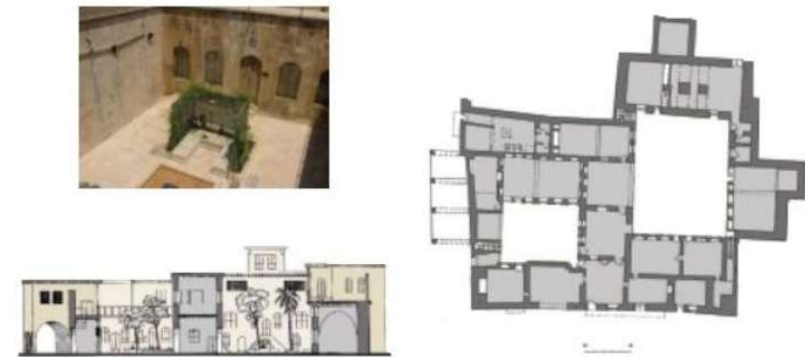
Courtyard house, CORPUS Levant, 2004
